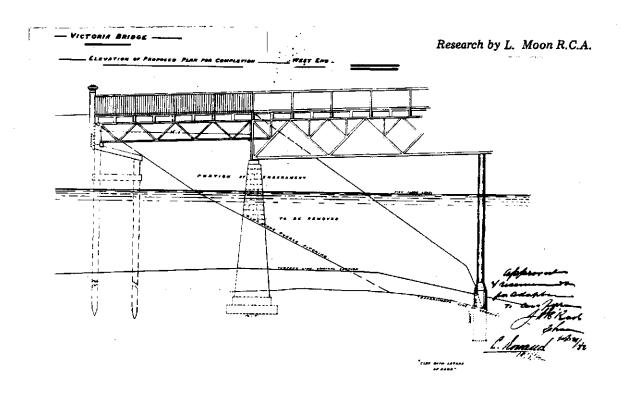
Original working drawing of Victoria Street bridge, 1880
